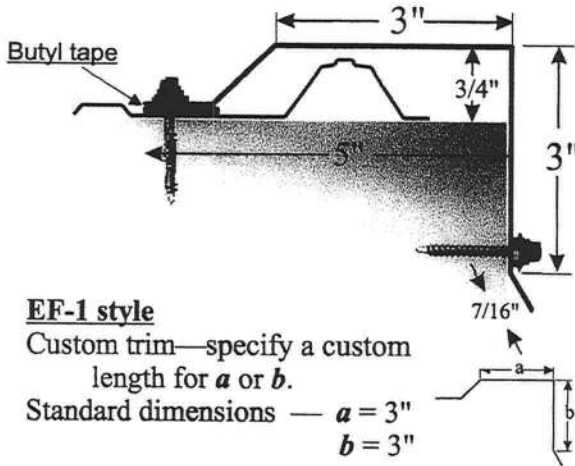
Gable flashing is used to trim the edge of the roofing panel at the gable end of the roof. It should match the eave drip that extends along the drip edge of the roof. If the panel is allowed to hang over the gable end, eave drip can be used instead. Butyl tape between the trim and panel eliminates leaks.
